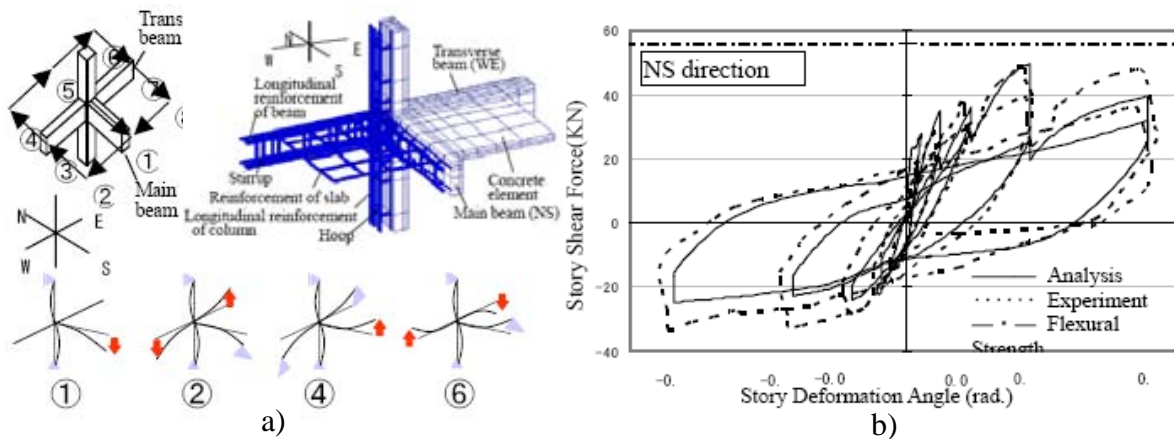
Bi-directional loadings on exterior beam-column joint with slab and transverse beam [20]: a) Test specimen and b) F_c - Δ_c in the longitudinal direction (images are adapted from [29]).
